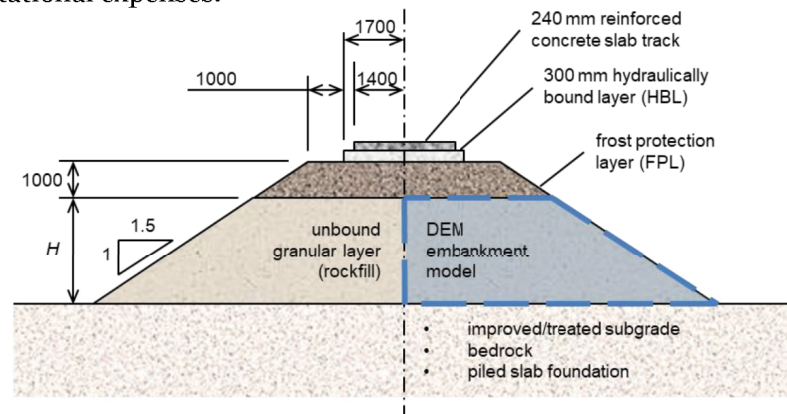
Schematic cross-section of rockfill embankment for slab-track configuration. All dimensions in mm.
